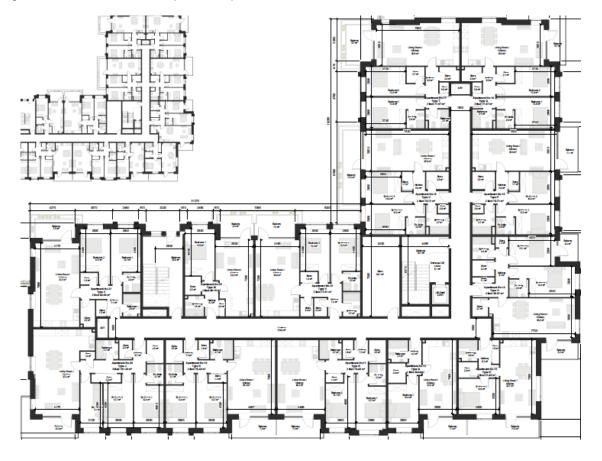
Ground floor plan for Apartment Blocks A & B.
